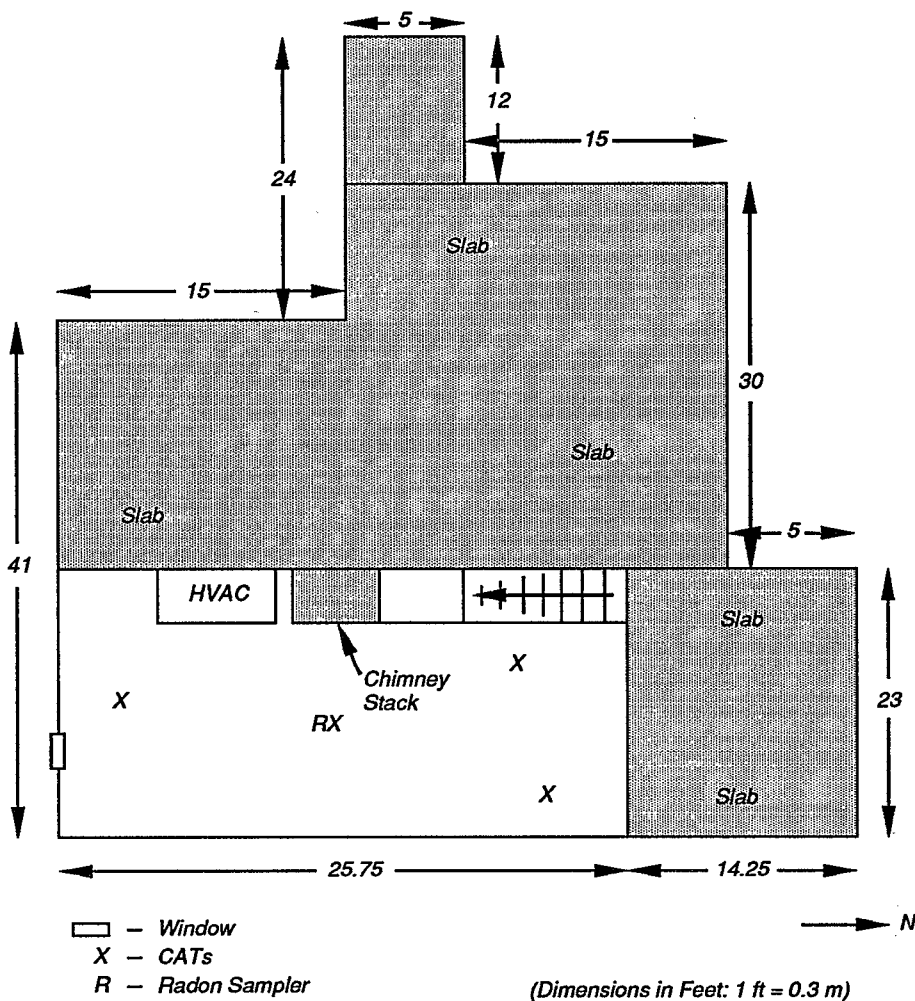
Basement floor plan of PU21 showing CATs, radon sampler, and window.
